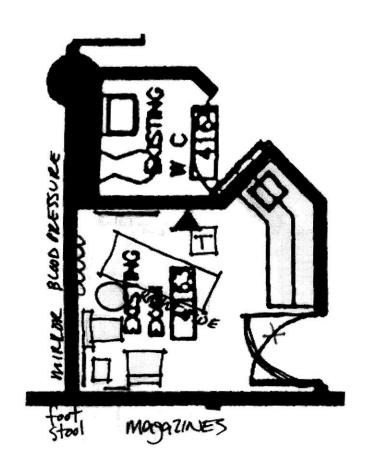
Drawing of exam room #2 east. Focus of drawing is furniture layout and shape of space.
